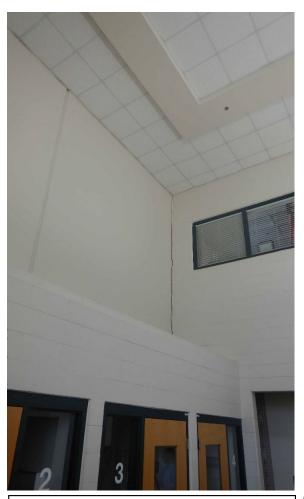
Vertical separation between exterior precast concrete wall panel (on left) and interior concrete masonry wall (with window).
